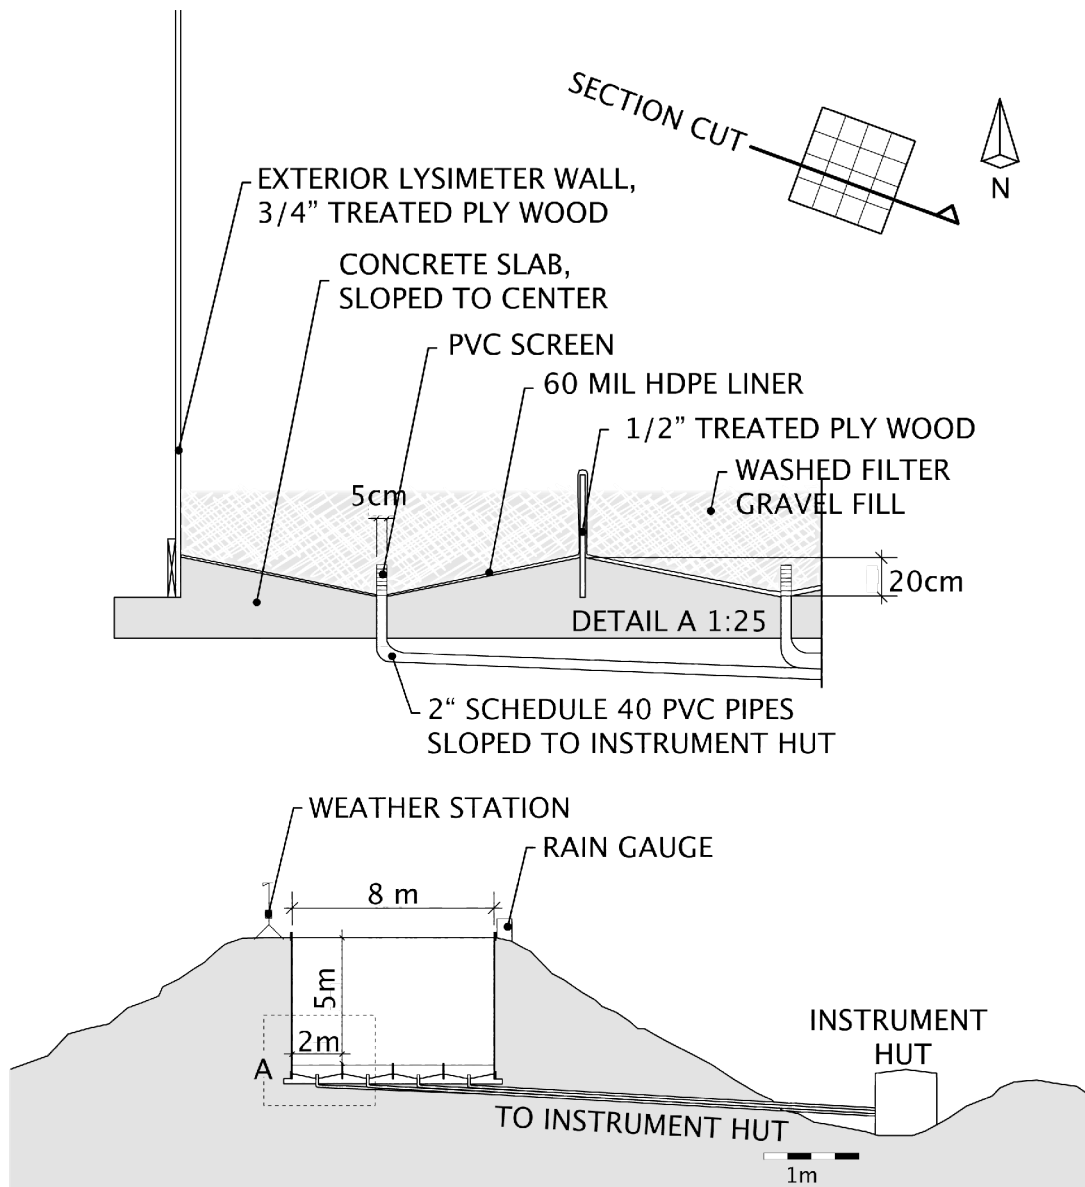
Cross-section of the constructed waste rock pile and a detail of the basal lysimeter design.
